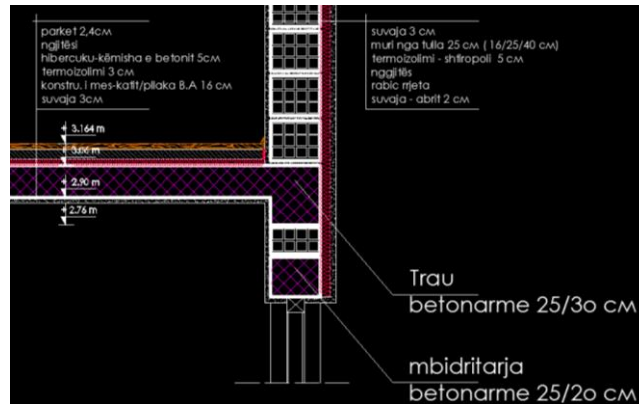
Floor as a structural detail of building and the floor covering element, Book “Konstruksionet Arkitektonike 2” (2020), Enis Jakupi, page 32
